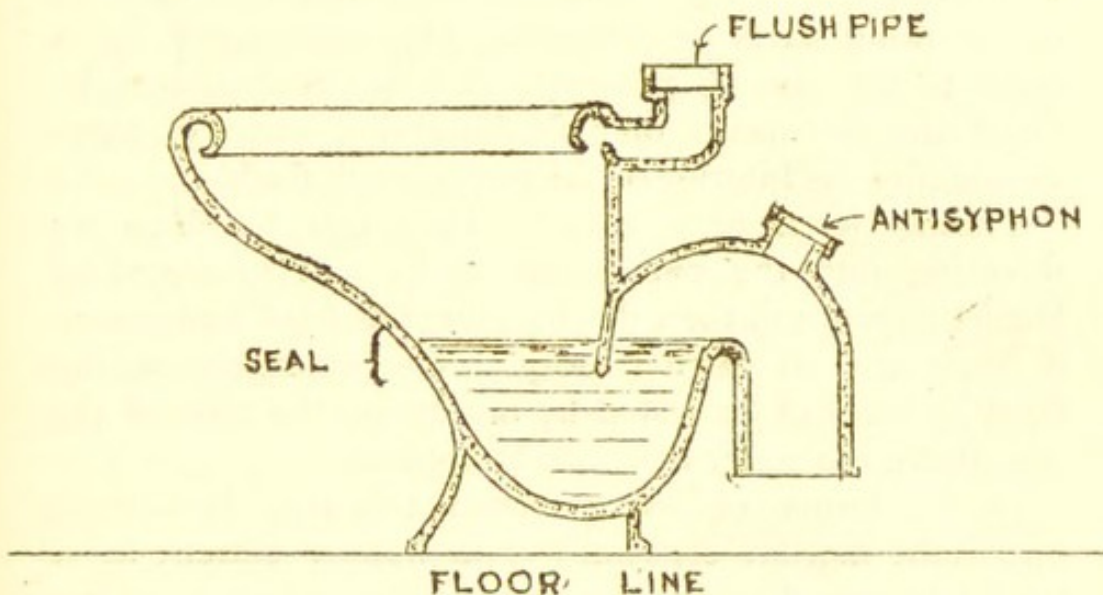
'WASH-DOWN' CLOSET, WITH BASIN AND TRAP IN ONE PIECE AND OVAL BASIN WITH STRAIGHT BACK.
